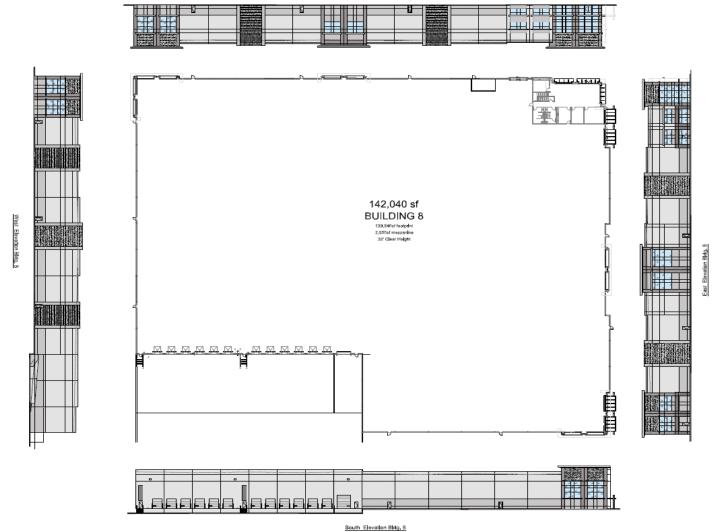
Exhibit M (Building 8) - BUILDING FLOOR PLAN AND ELEVATIONS
